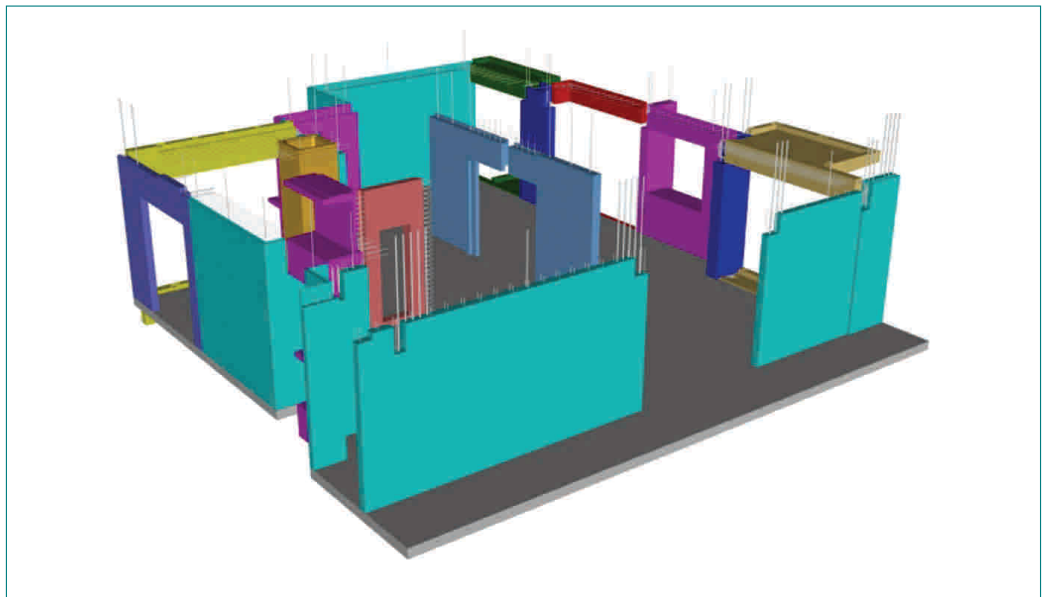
An assemblage of precast elements that need to be connected at joints to form building framework
